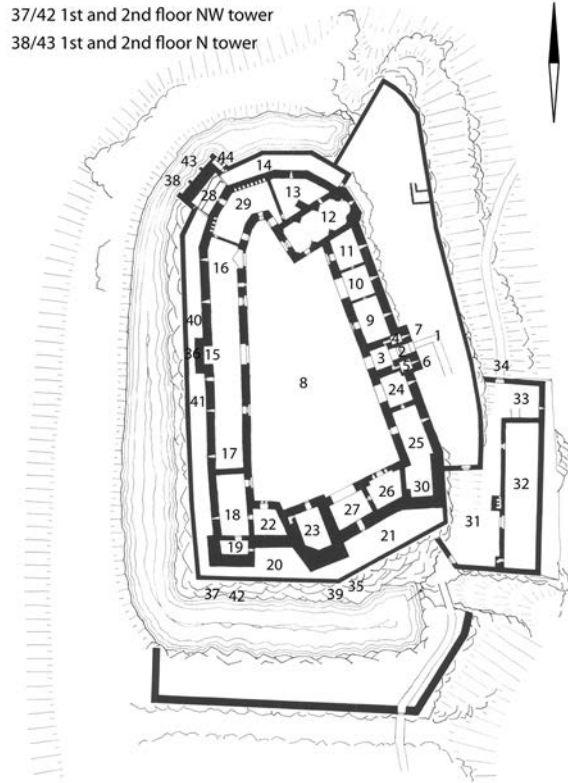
Plan of Crac des Chevaliers from 1170. Created after plan of Biller 2006.
